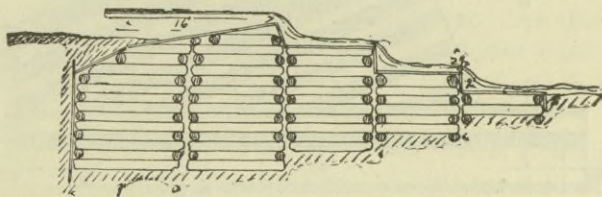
CROSS-SECTION OF ARIZONA WEIR.
